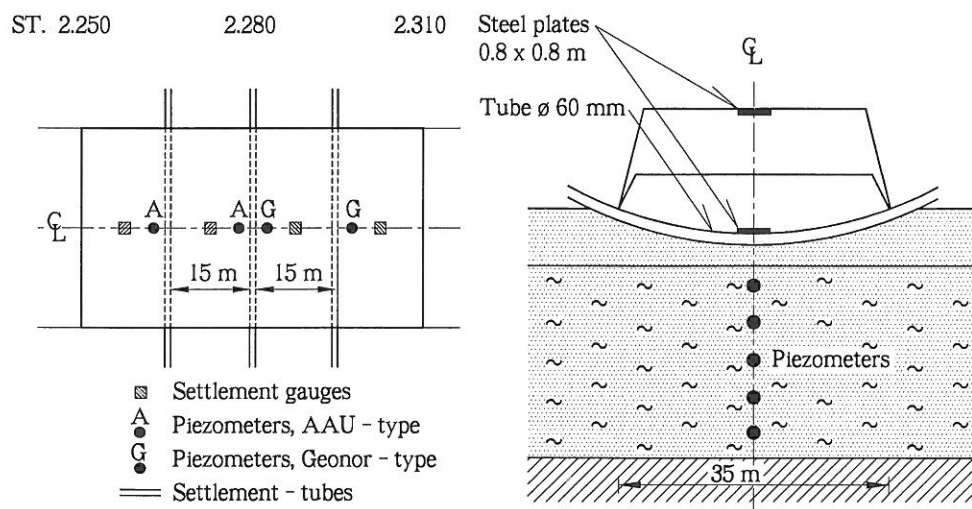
Principle of instrumentation of test embankment. (a) plan; (b) cross section.
